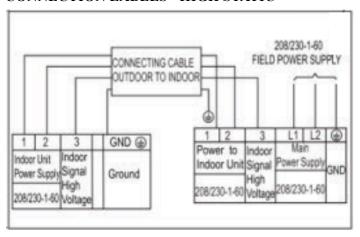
9K/12K, 18K, 24K Connection Label
